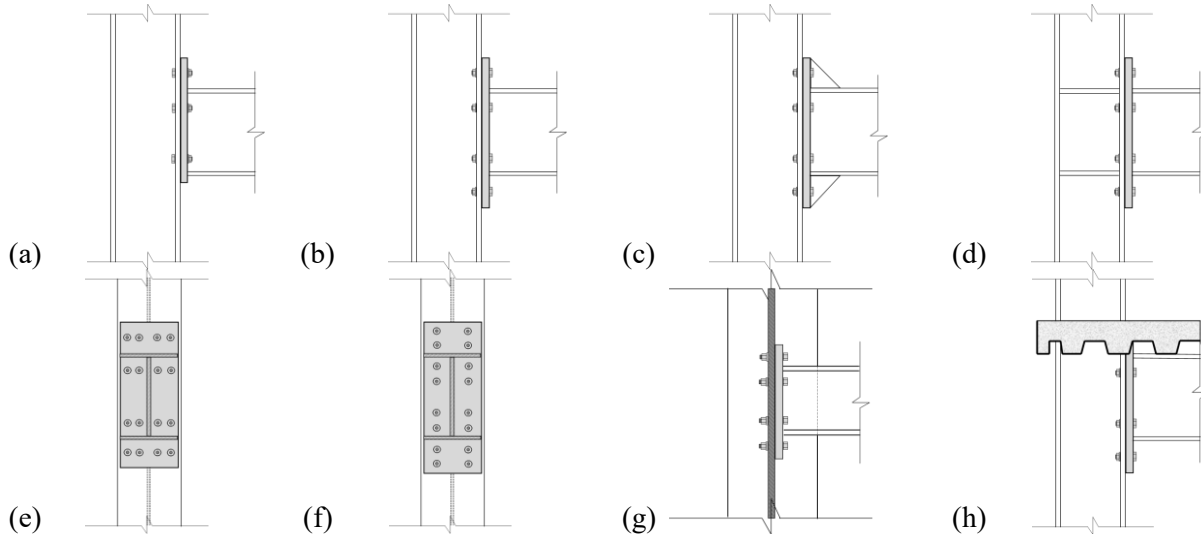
Typical EEPCs classified by topology: (a) single-sided; (b) double-sided; (c) stiffened plate; (d) stiffened column web; (e) multiple bolts per row; (f) multiple bolt rows above the beam flange; (g) weak axis; (h) transverse steel deck.
